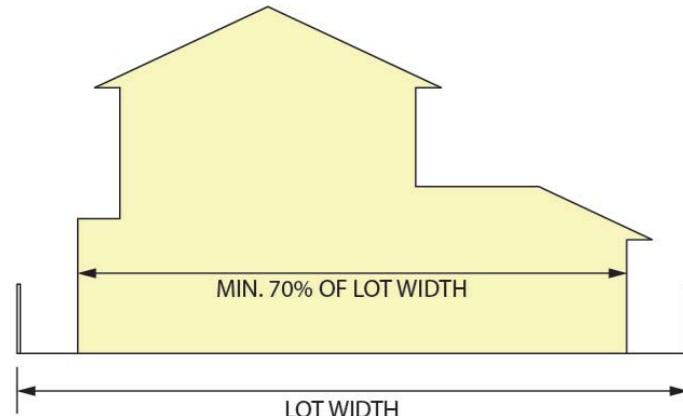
The width of your house across the front facade must be at least 70% of the lot width.
